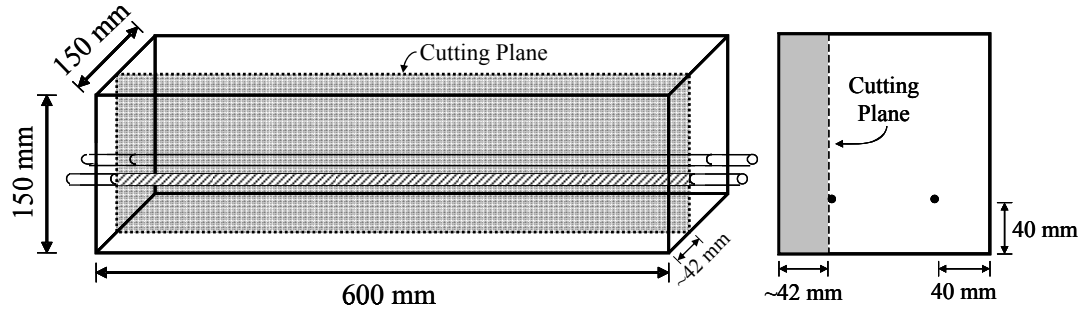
Specimen Geometry with Location of Saw Cutting Indicated.
